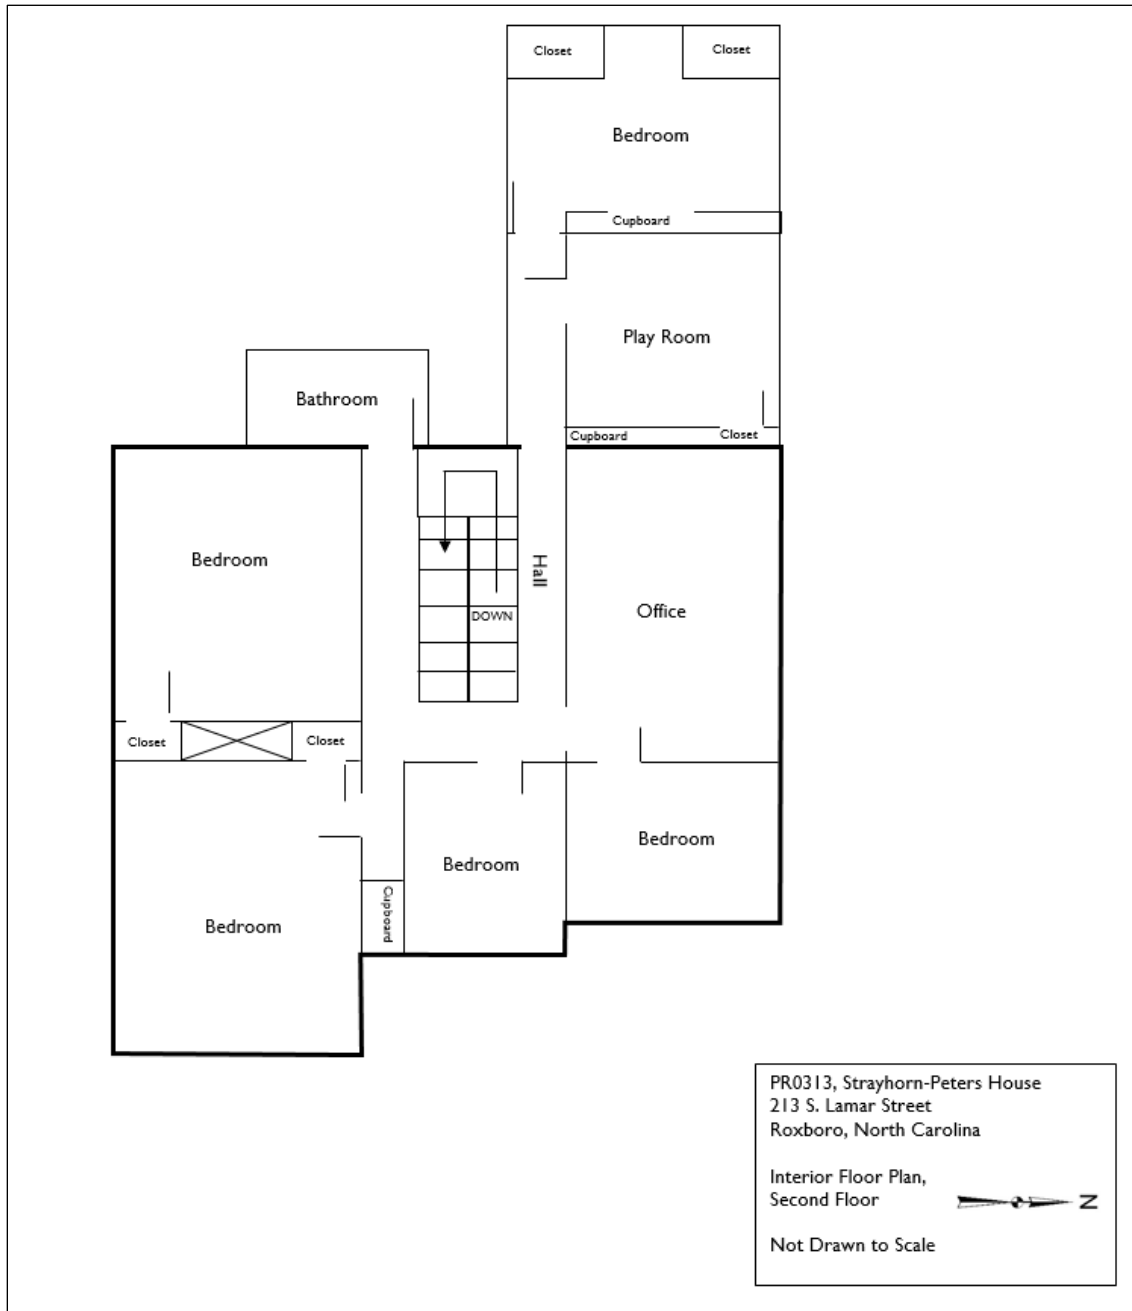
Interior Second Story Floor Plan of Strayhorn-Peters House.
